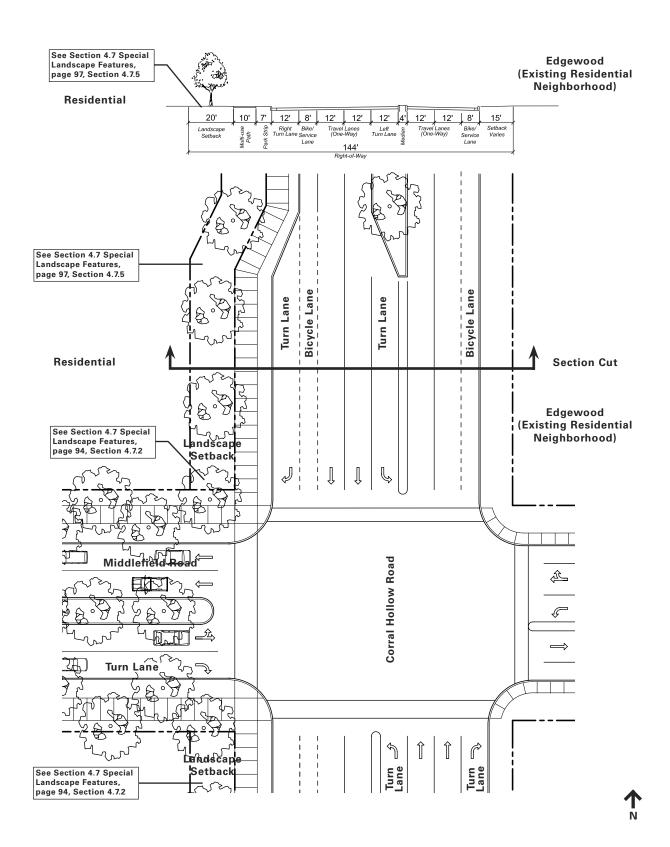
Build-out Section and Plan: Regional Arterial - Corral Hollow Road, Designation B (Final Build-out)
